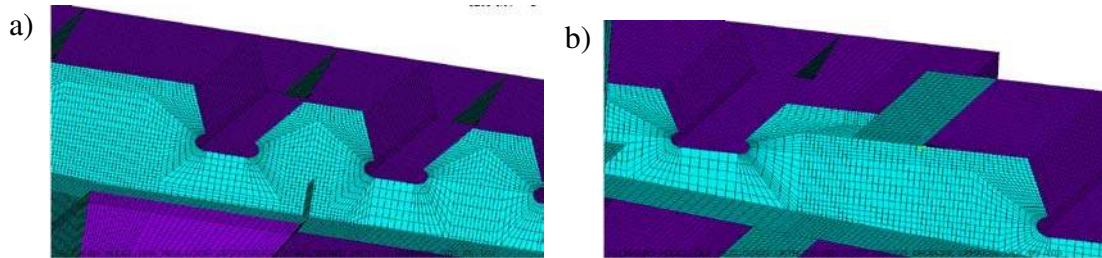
a) Connection of cross-beam to main girder. b) Connection of deck plate to pedestrian road.
